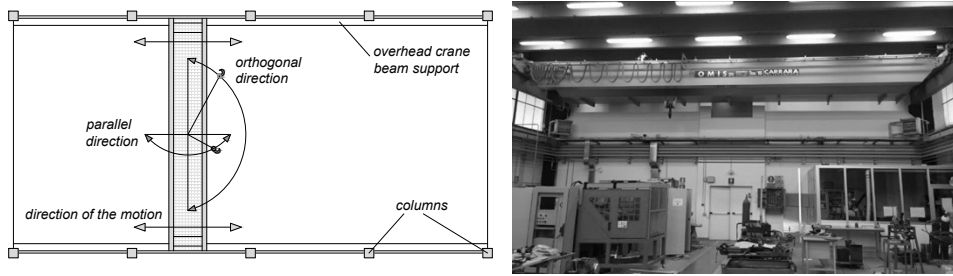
Plan view of the precast shed with an indication of the directions when the hook was raised (left) and one example of an overhead crane in a precast reinforced concrete industrial building (right).
